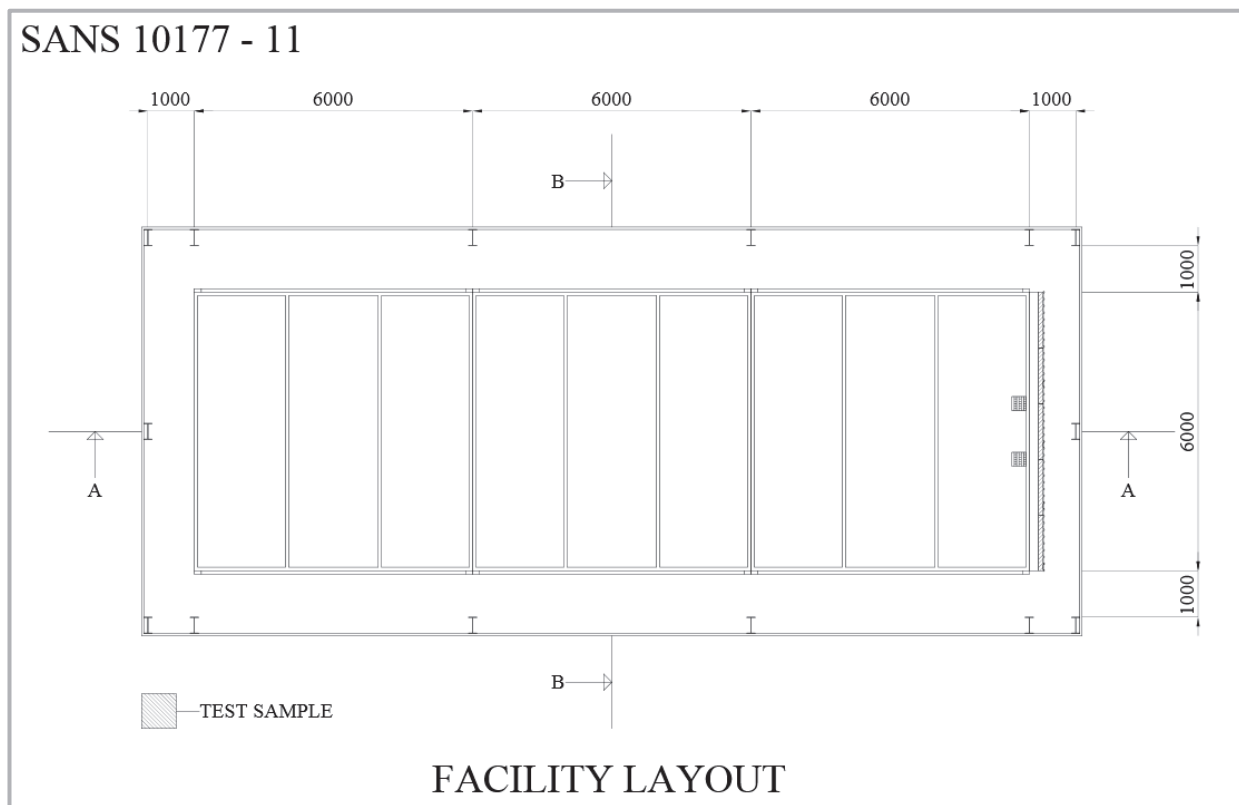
SANS 10177-11 facility plan view for vertical test
